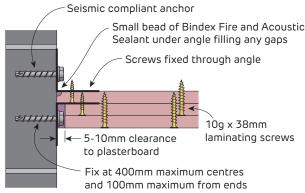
Laminated Vertical Shaft to Masonry Wall Plan view
